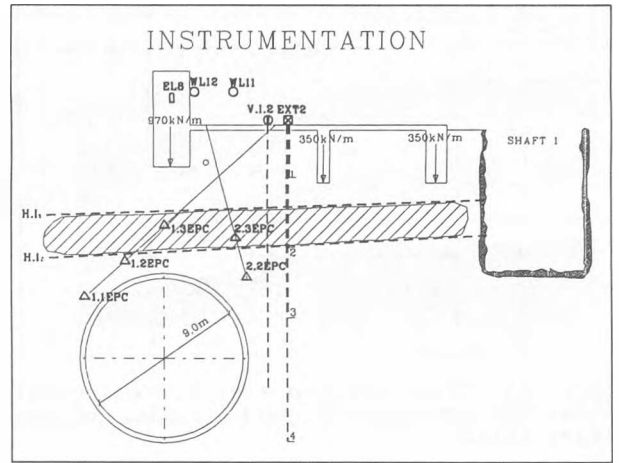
Cross section test field area 2: Installed monitoring system (legend Figure 8)
